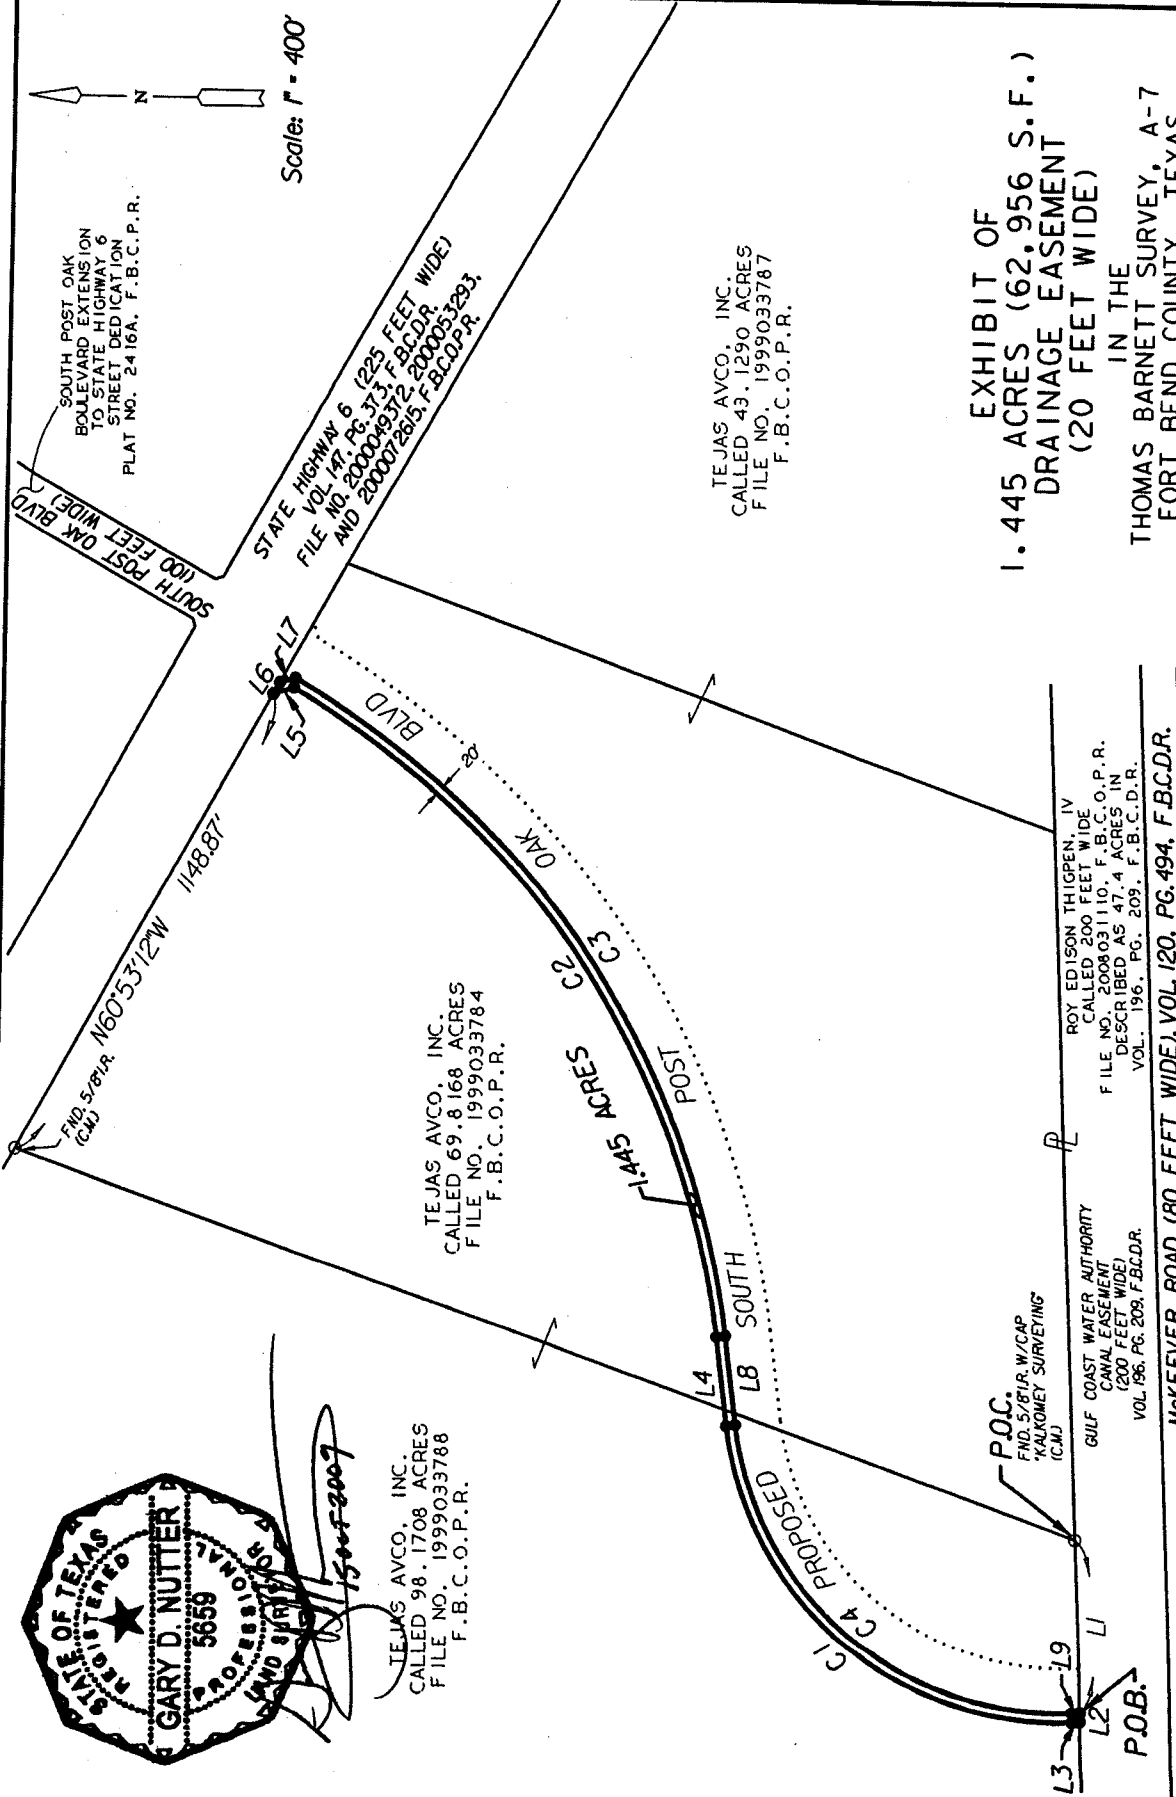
ACRES (62,956 S.F.) DRAINAGE EASEMENT (20 FEET WIDE)
